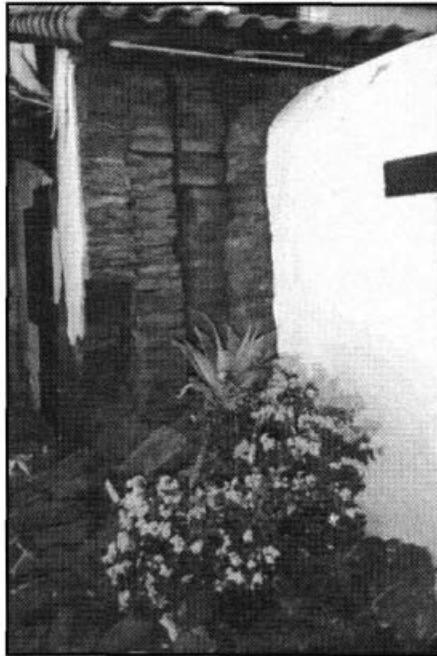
Northwest corner of the kitchen. The layout of the bricks in this area was partially responsible for the collapse at this location. At first glance, it appears that the wall is 3 wythes wide, but the wall on the left of the photograph is only 2 wythes wide. The third wythe is a connecting section between the two walls.
